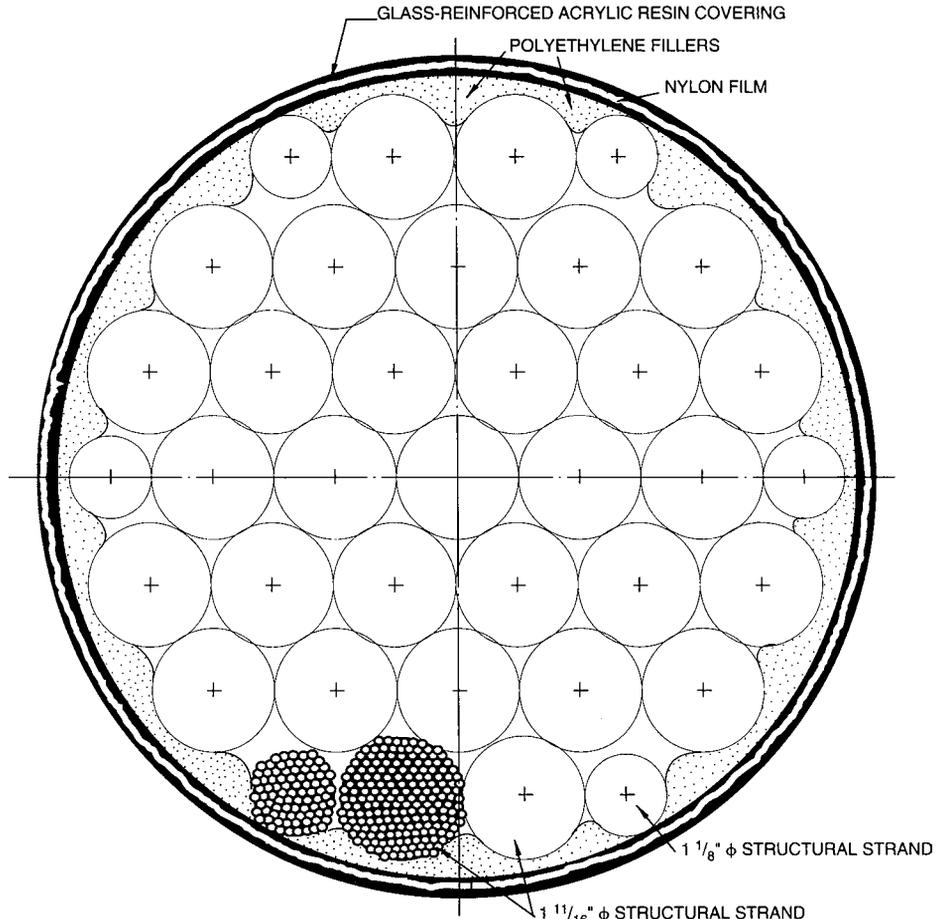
Cable corrosion-protection system used for the Bidwell Bar Bridge. (Reprinted with permission from J. L. Durkee, "Advancements in Suspension Bridge Cable Construction," Paper No. 27, Symposium on Suspension Bridges, Lisbon, November 1966.)
